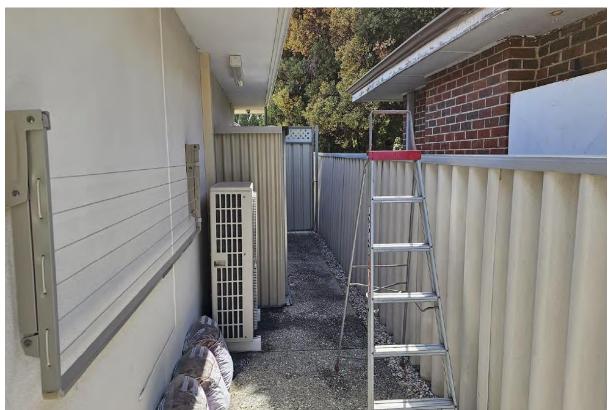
View looking south towards adjoining southern property where subject wall would face
